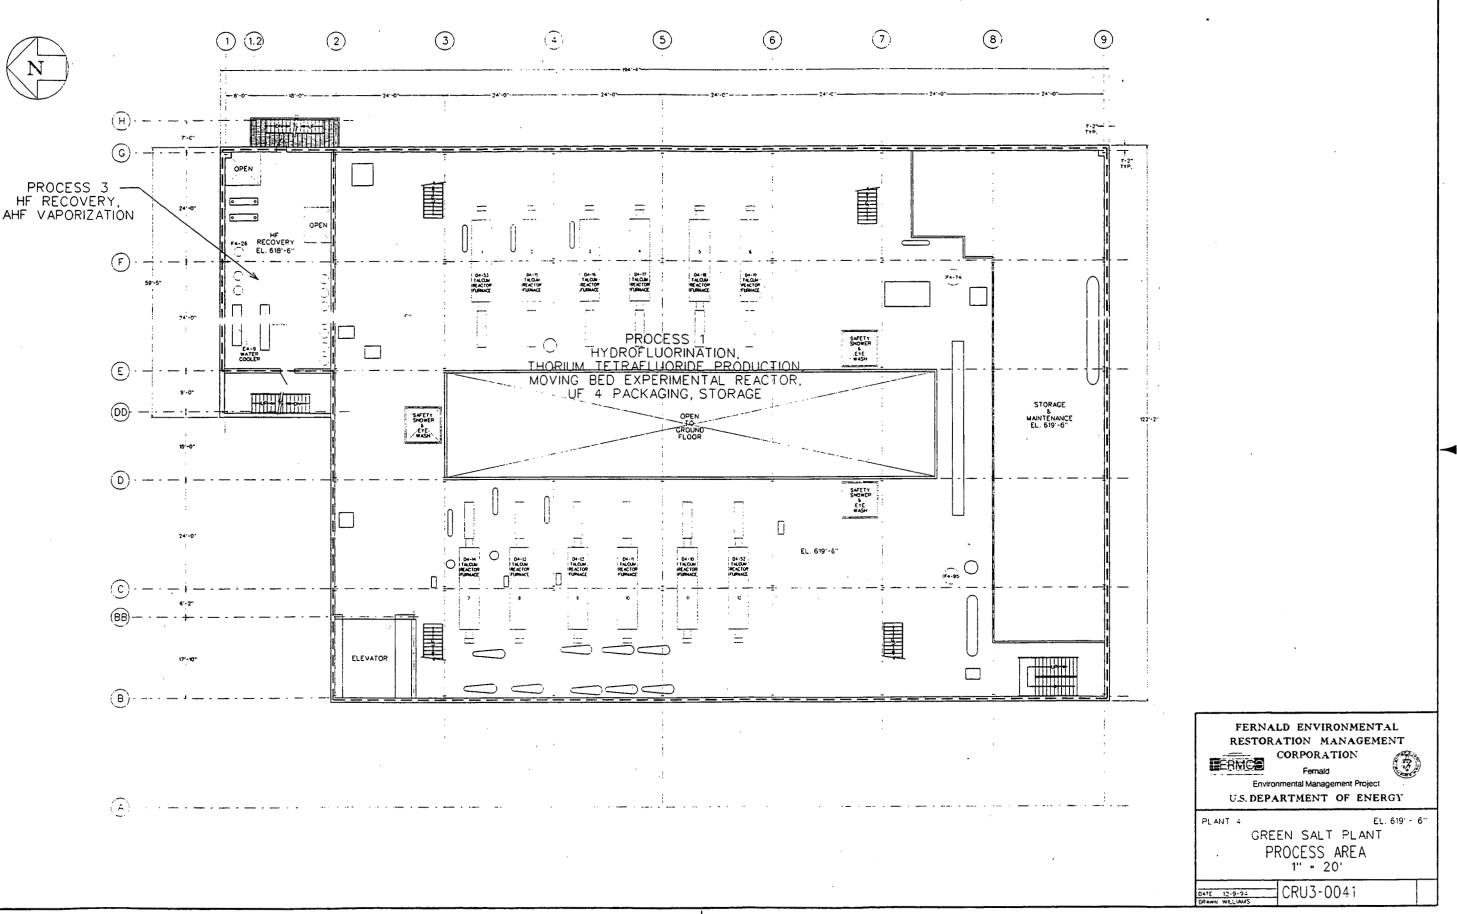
Floor Plan of Building 4A - Sixth Level (ELEV. 619'-6") 00063
